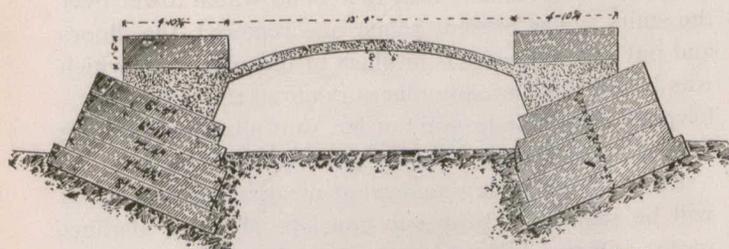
CONCRETE ARCH WITH MASONRY ABUTMENT.
